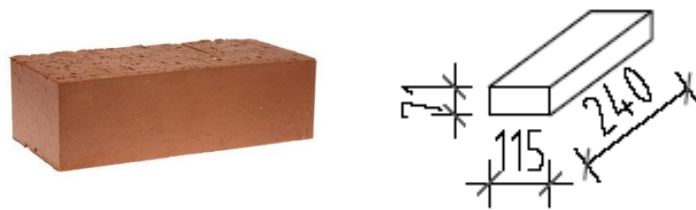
Dimensions of the fundamental element used in the masonry specimens.
